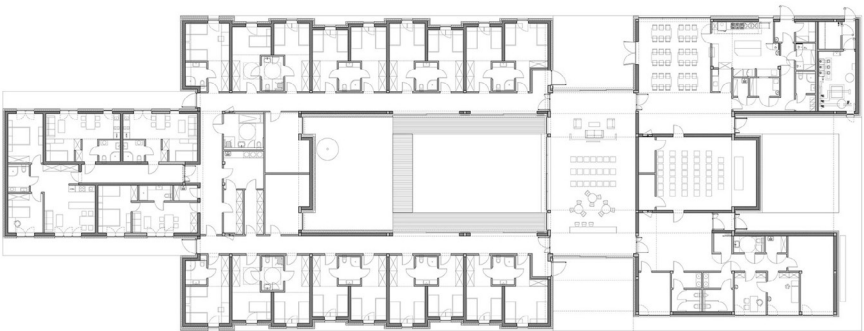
Floorplan [xystudio, n.d.]
